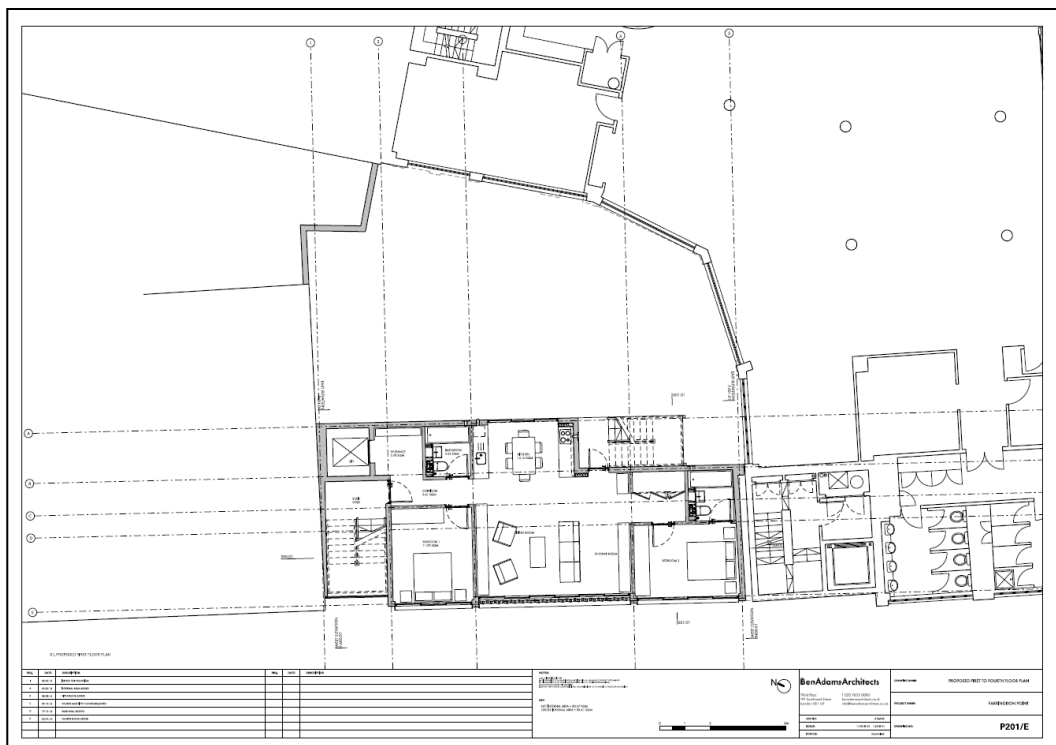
Proposed First, Second, Third and Fourth Floors (©Ben Adams Architects)
